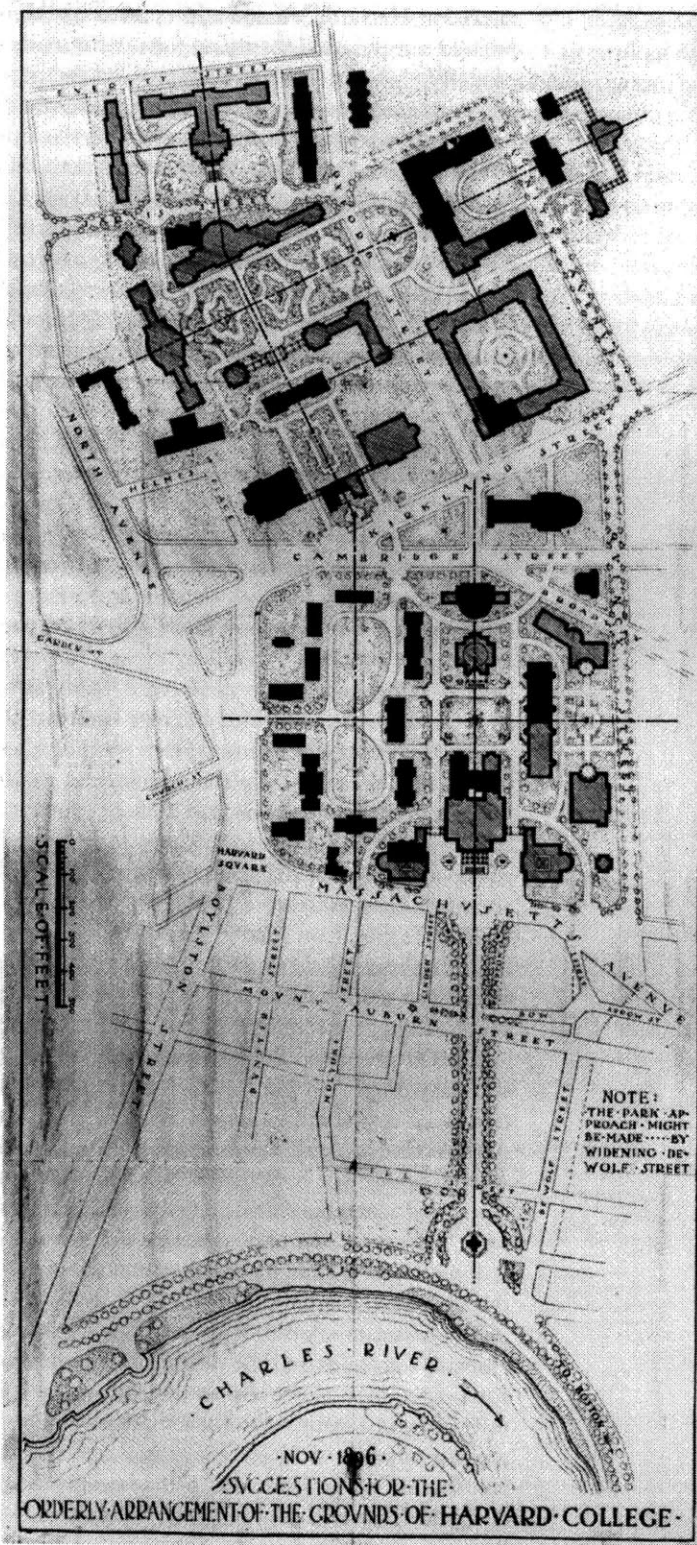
Plan for Harvard College, 1896, author unknown.
